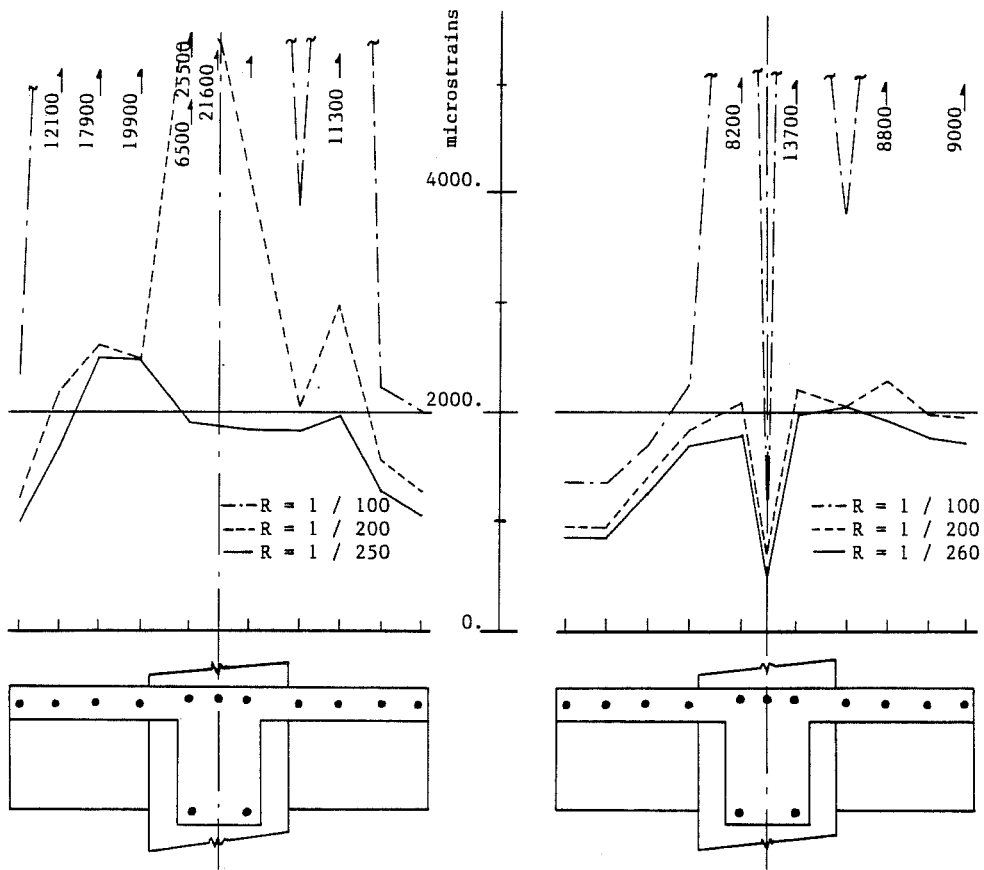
Exterior Joint Slab Steel Yielding (enlarged).
